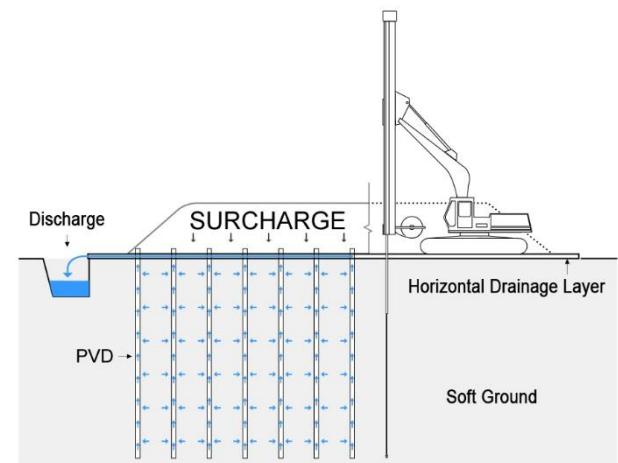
Preloading embankment combined with wick drains. (Source: Prefabricated Vertical Drains, 2017).
